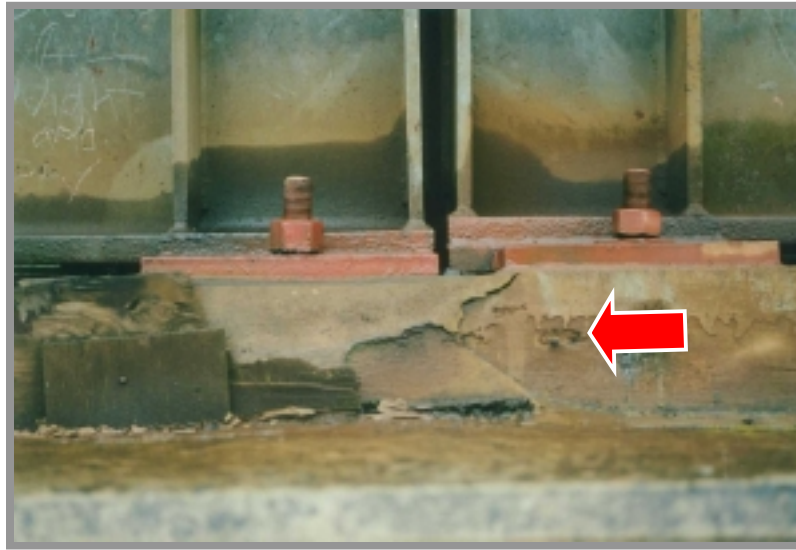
Damage at the pier beneath the fixed bearing at one of the Mullet Creek Railway Bridge approach spans.
